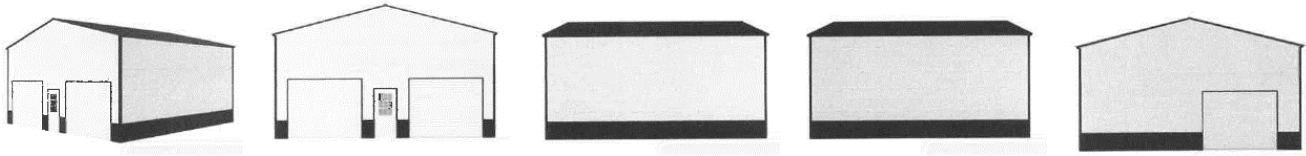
BUILDING ELEVATIONS PROVIDED BY THE APPLICANT
